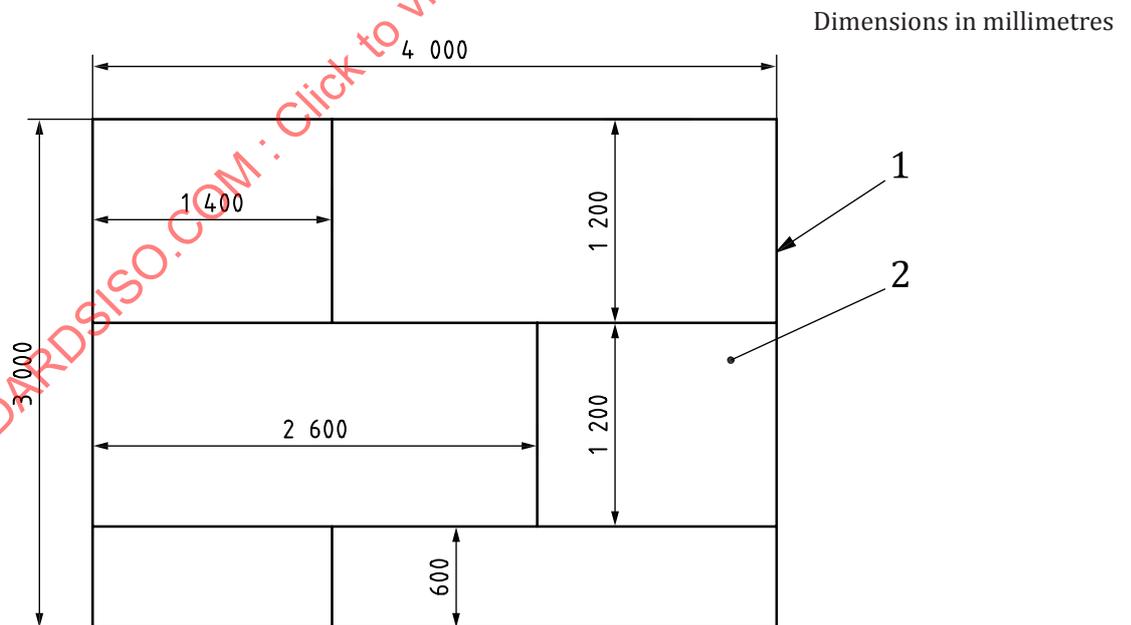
Details of horizontal supporting construction — Layout of support channels
